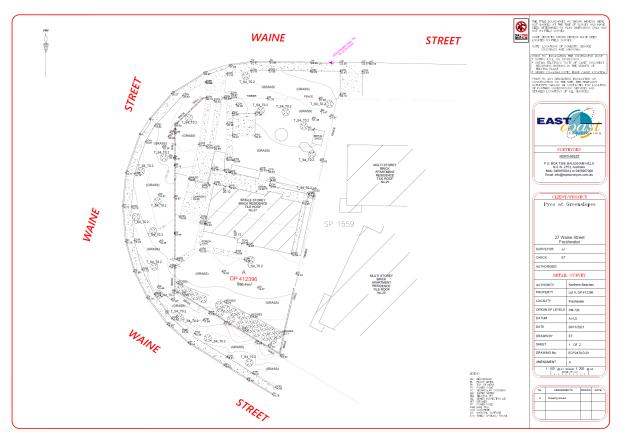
Survey plan (Source: East Coast Positioning)
